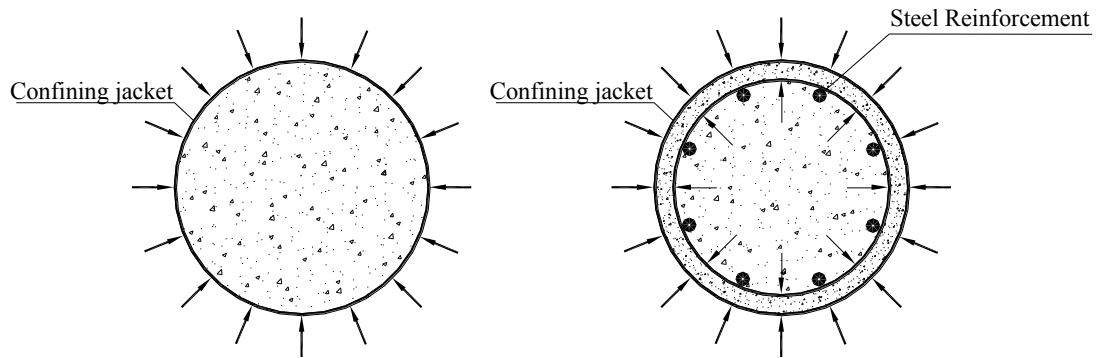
Circular Concrete Section confined by steel stirrups and/or FRP Jackets
